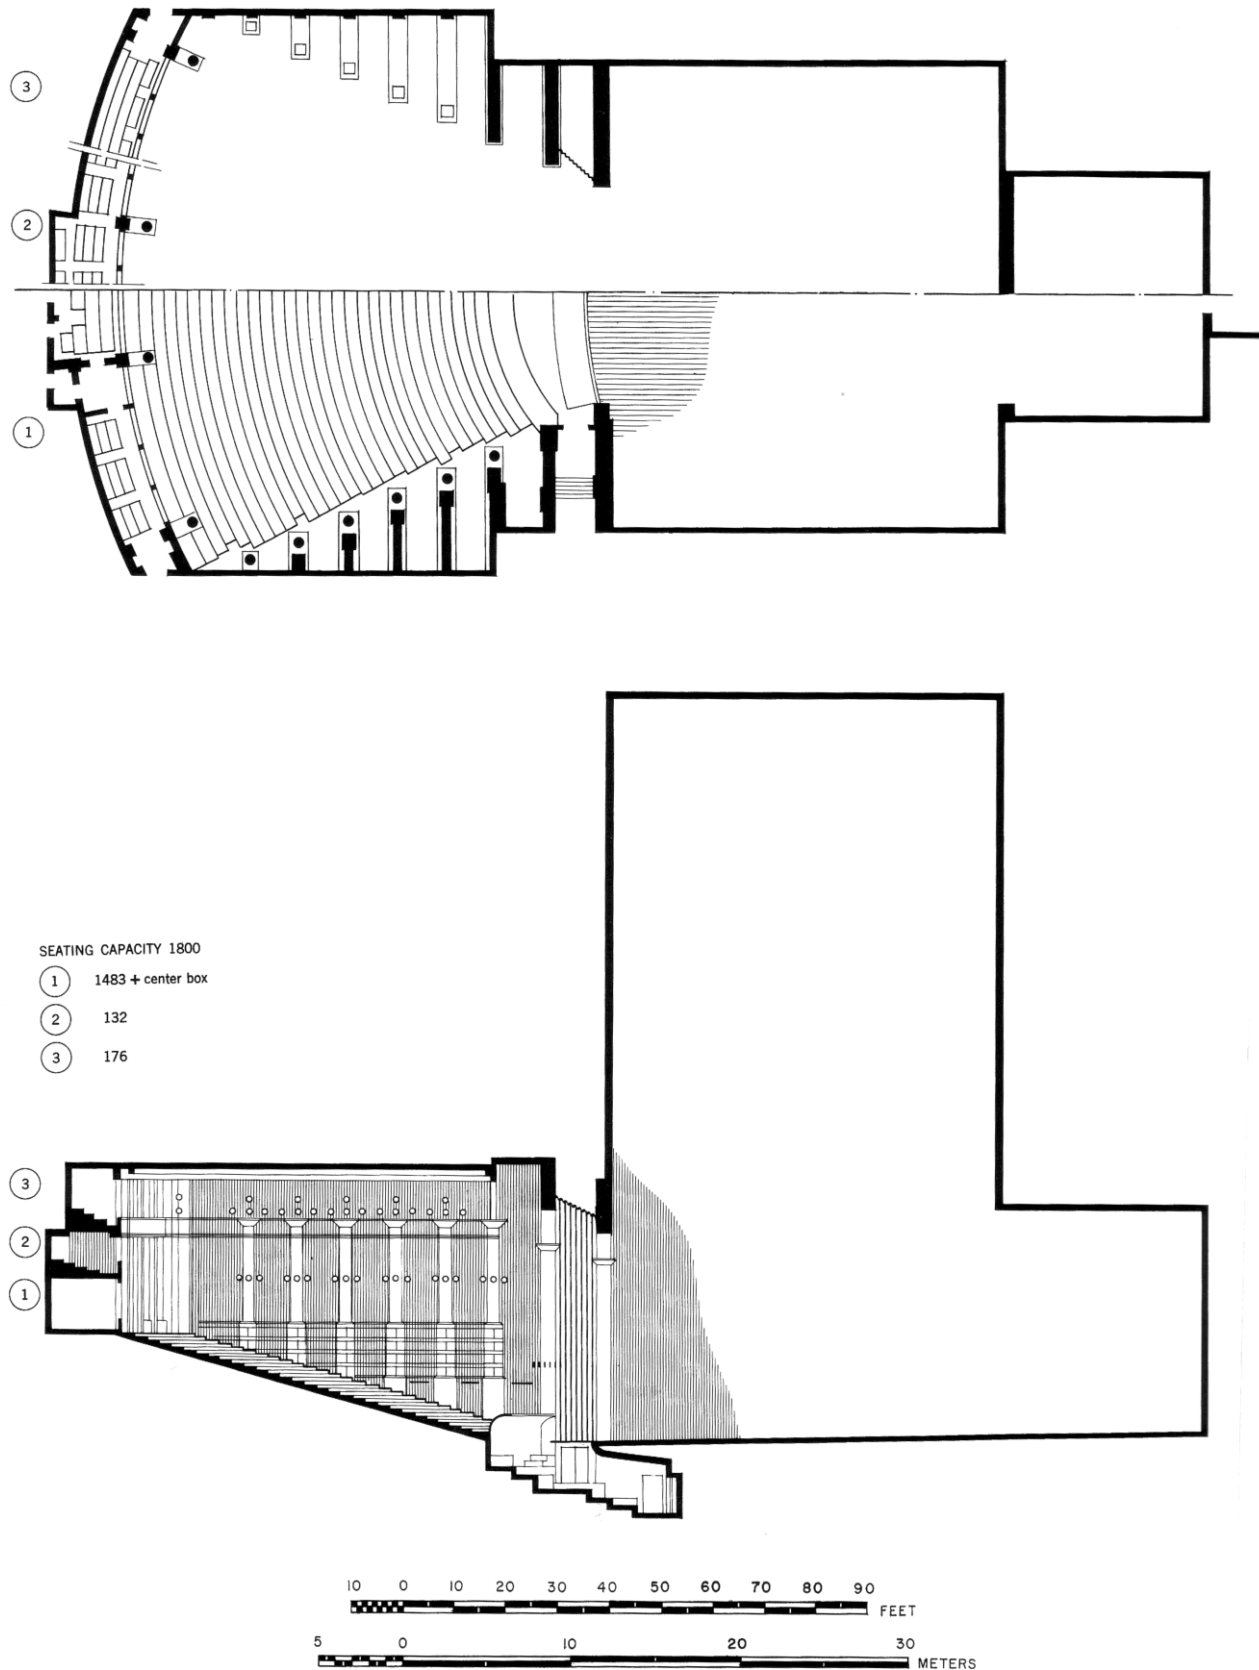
Germany, Bayreuth, Festspielhaus, plan and section
